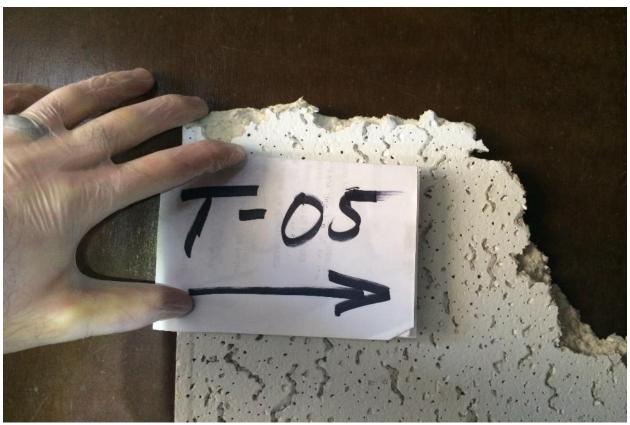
Laboratory analyses detected 2% chrysotile asbestos within suspended ceiling tile sample TS-06 collected from the Theatre Building hallway (sample should be labeled TS-06).
